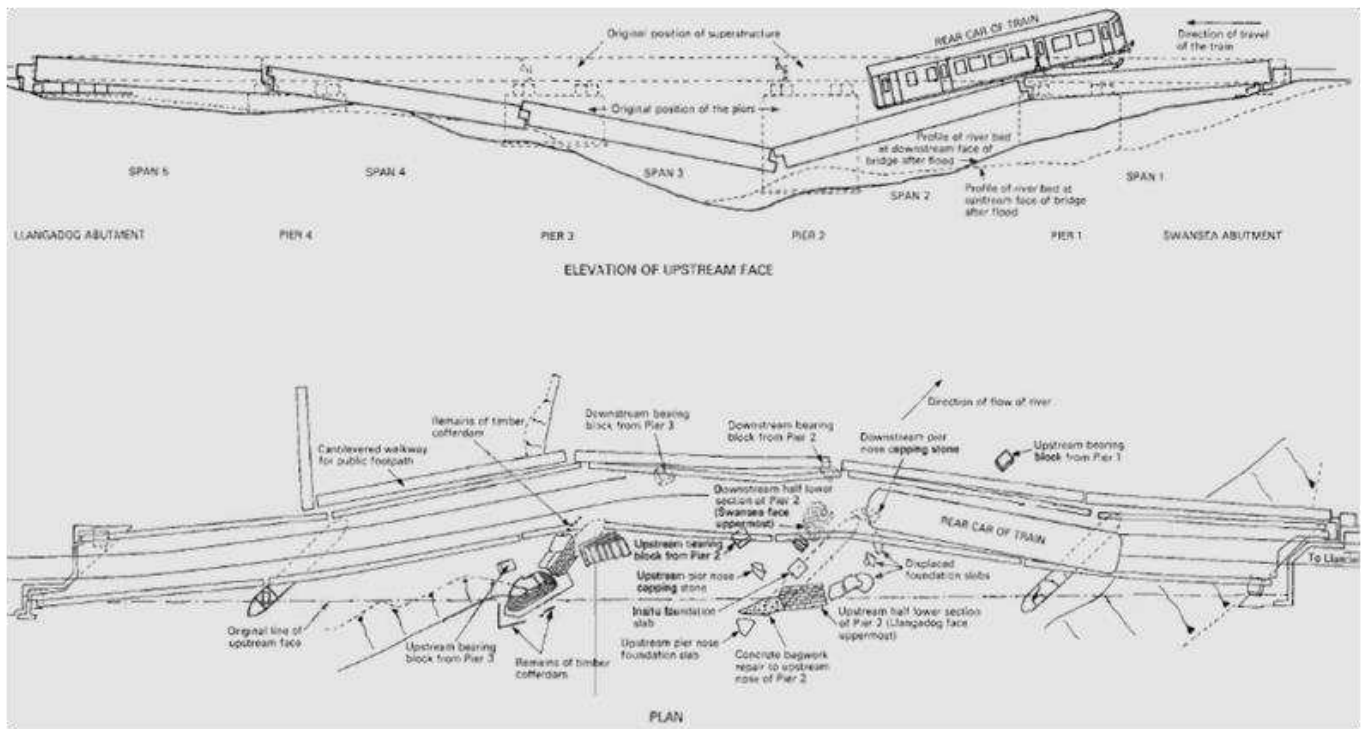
Sketch of Glanrhyd Bridge failure [19]
